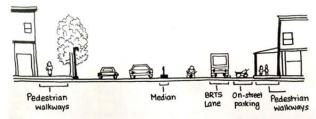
Street Section of Major Road (New Market Road, Bhopal)
